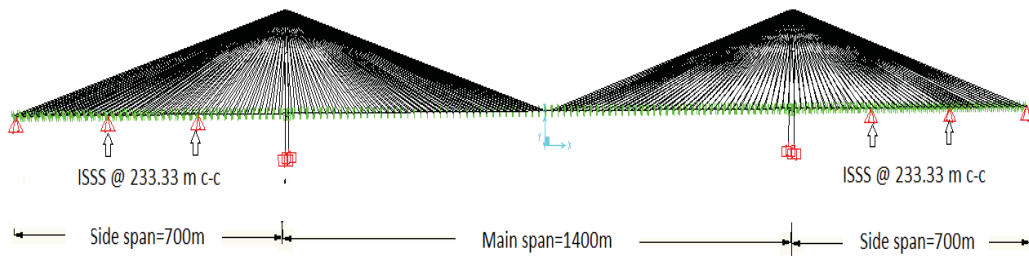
Cable stayed bridge with two ISSS in side span at 233.33m c-c
